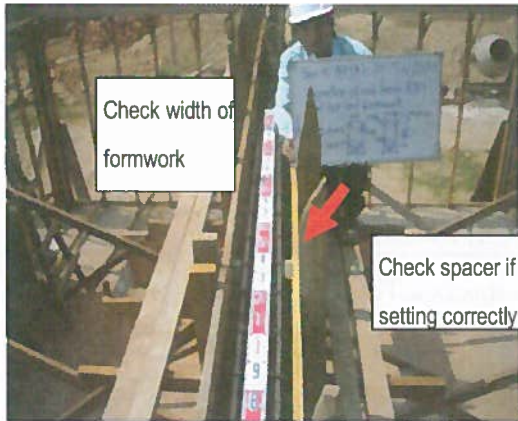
Check rebar size, formwork size, spacer, overlap
